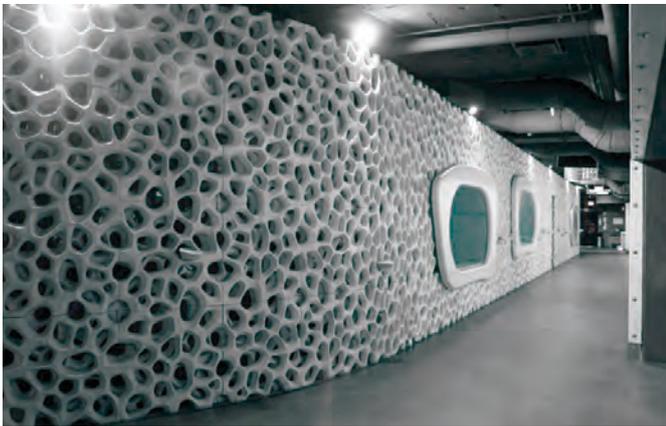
, "Cocoon Club", panellised concrete wall, design by 3deluxe, development of concrete elements by Villa Rocca
